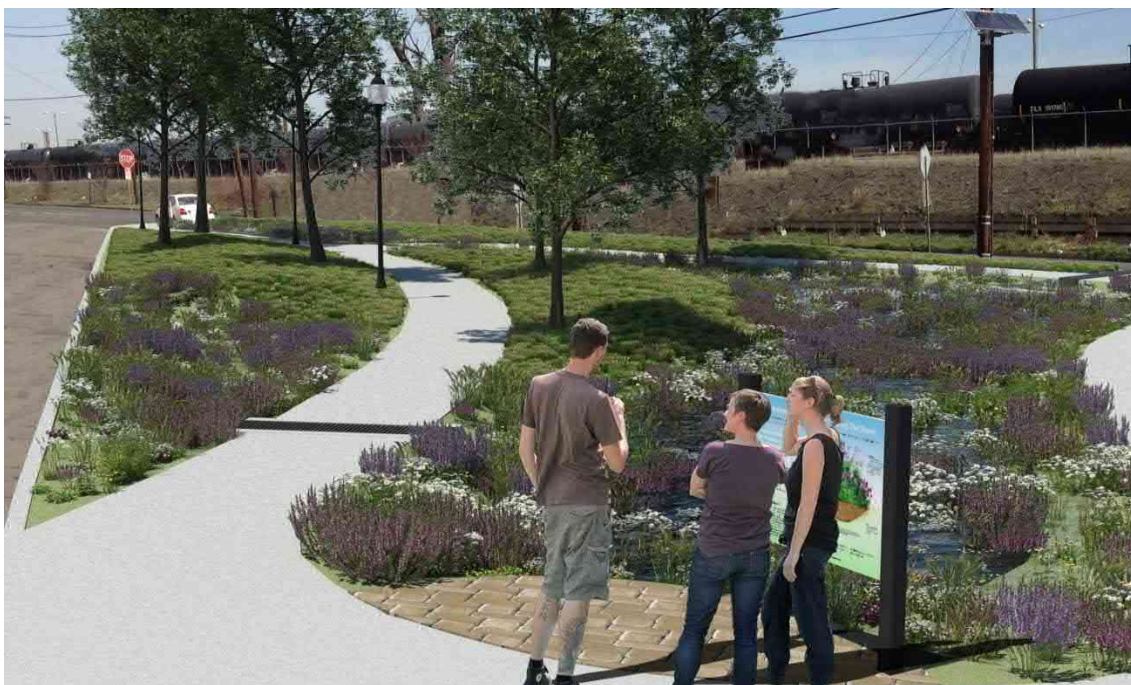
Trumbull Street Stormwater Control Project Rain Garden Rendering
